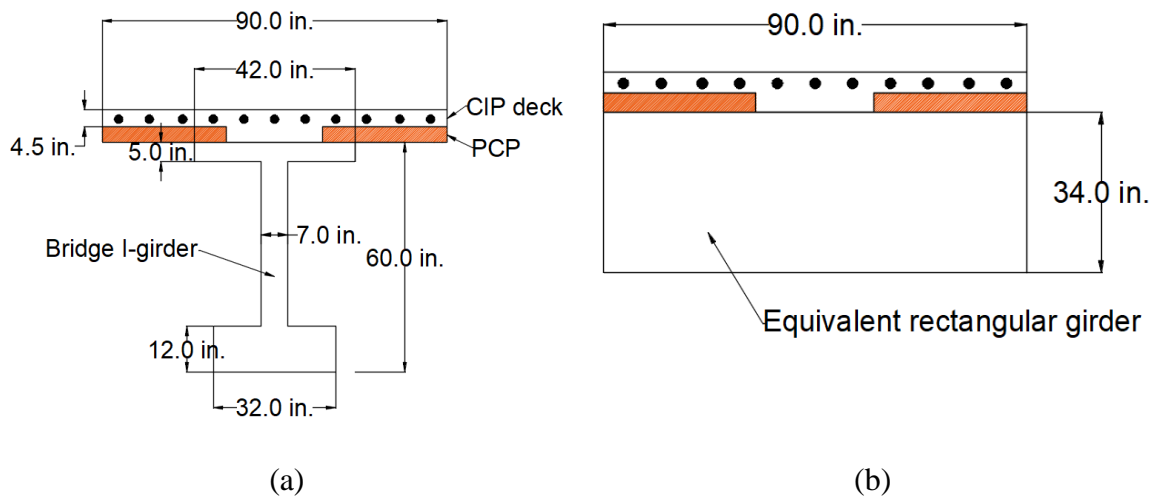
Cross-section of the prototype bridge for a tributary width: (a) Bridge deck over I-girder; (b) Bridge deck over equivalent rectangular girder.
